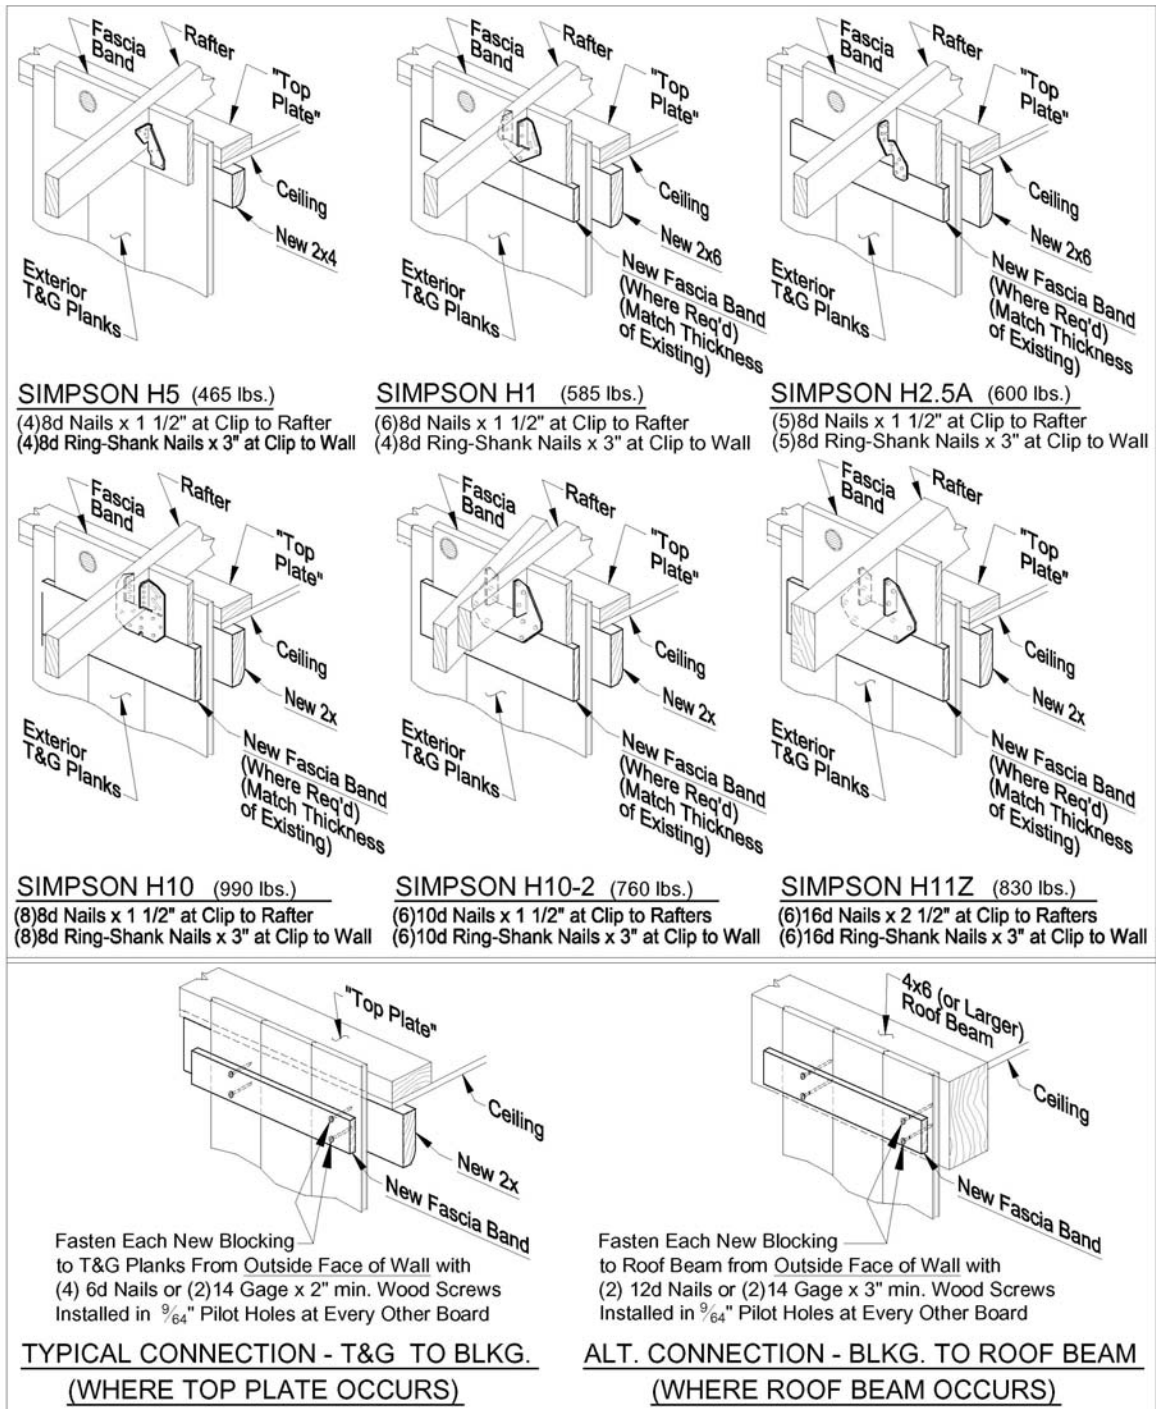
Roof to Wall Uplift Resistant Ties for "Single Wall" Construction
